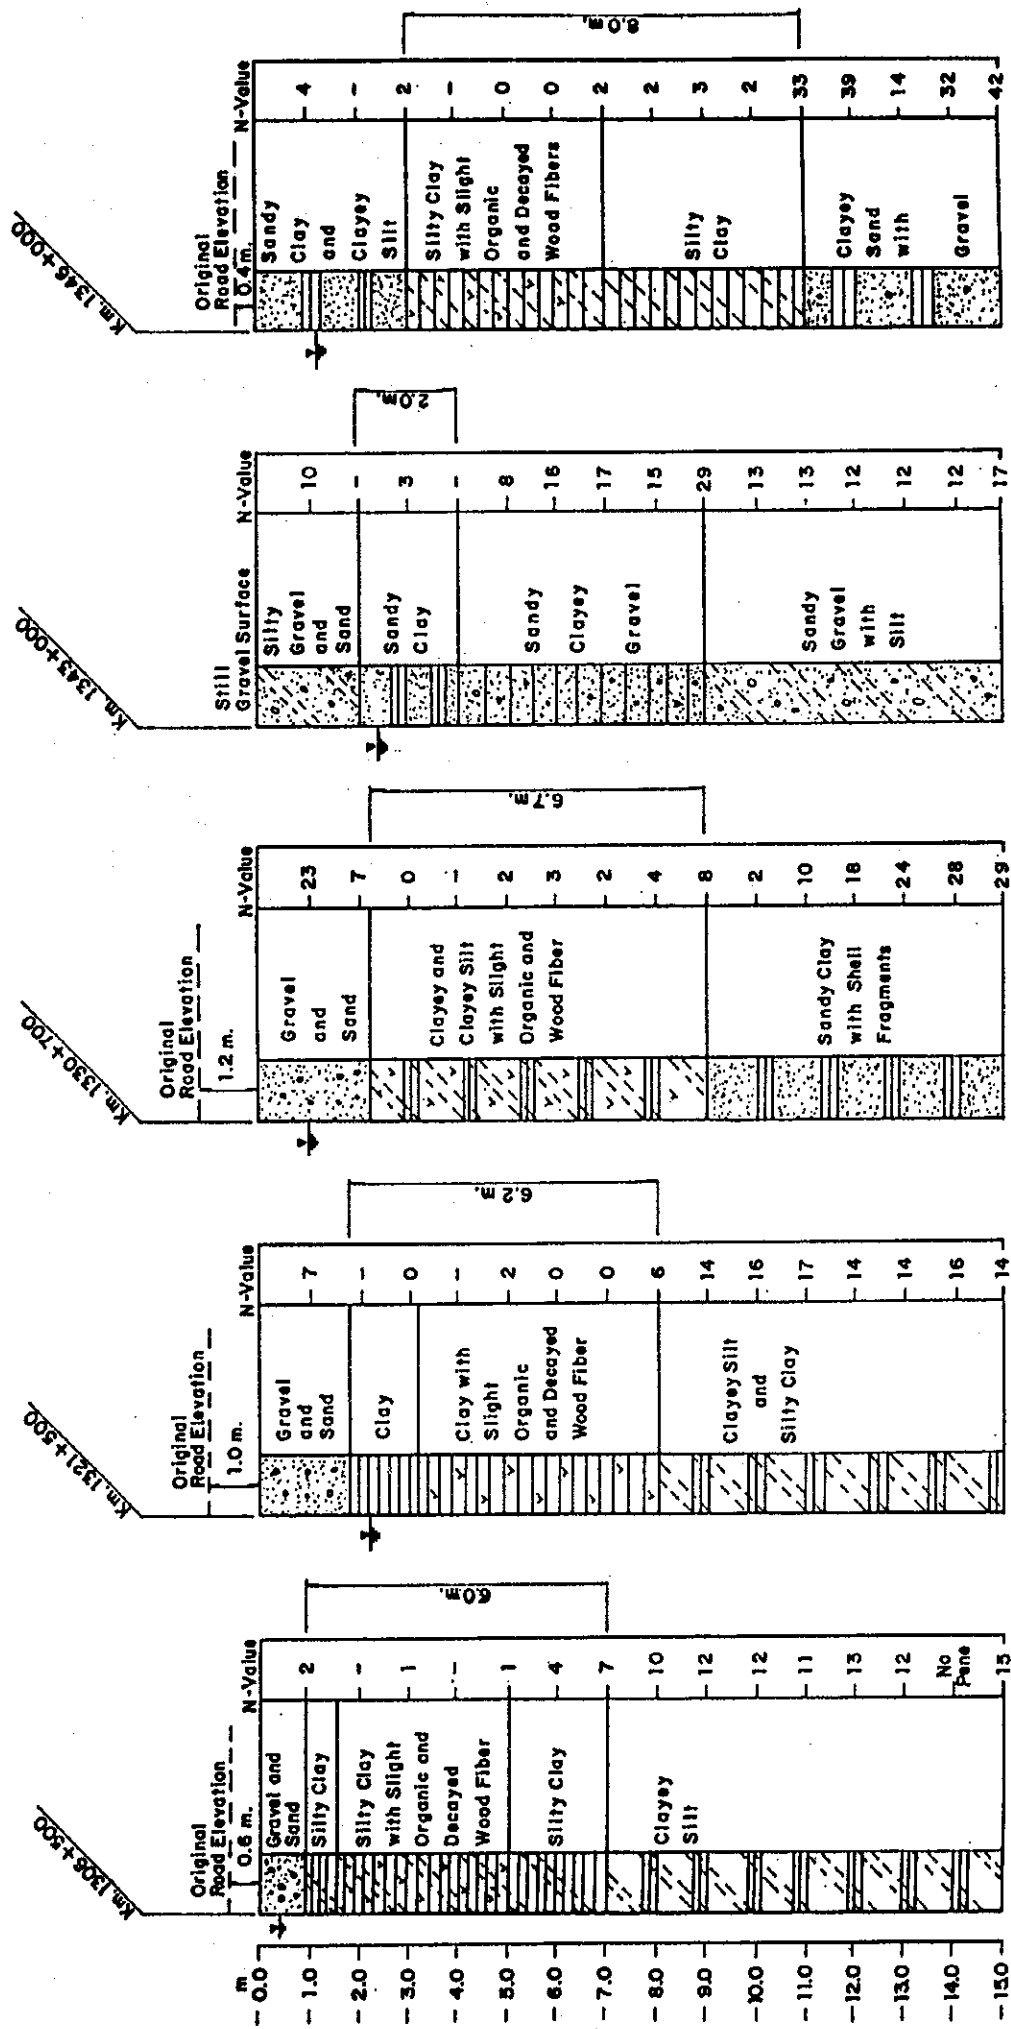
BORING RESULTS OF SOFT SUBGRADE SECTIONS
